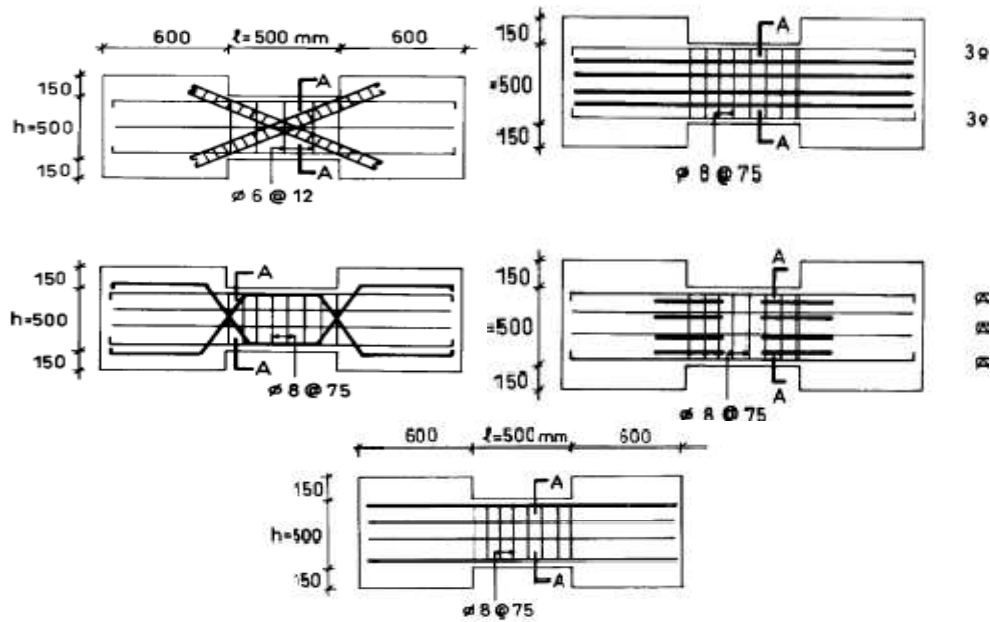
Reinforcement Layouts for Coupling Beam Specimens (Tassios et al., 1996)
